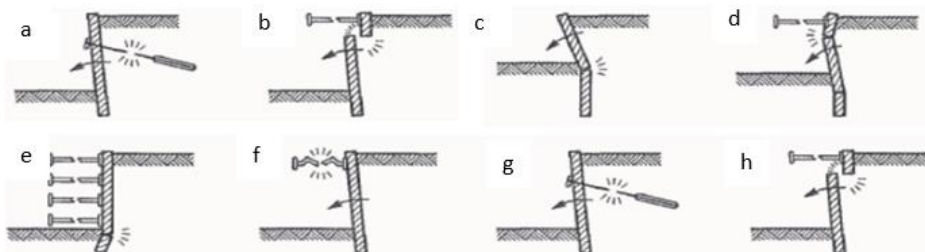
Rotational failure of the wall section (Eurocode 7)
